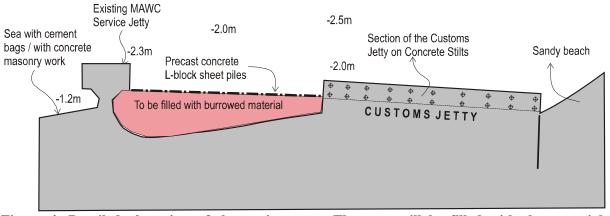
Detailed plan view of the project area. The area will be filled with the material borrowed from the adjacent areas
